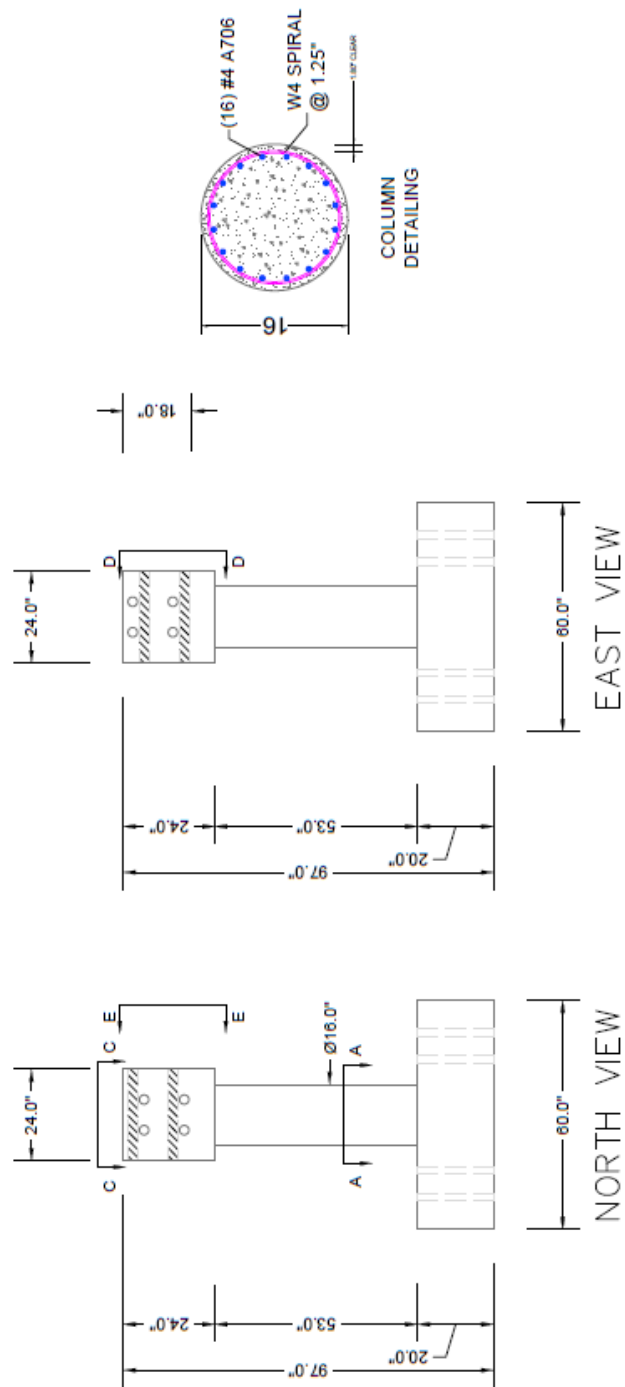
Conventional cast-in-place shake table specimen: elevation and cross section
